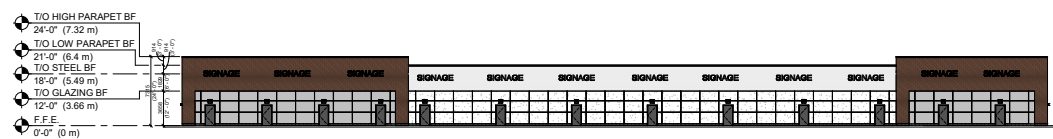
Commercial Building F South Elevation (typical concept design for commercial buildings on proposed site)
